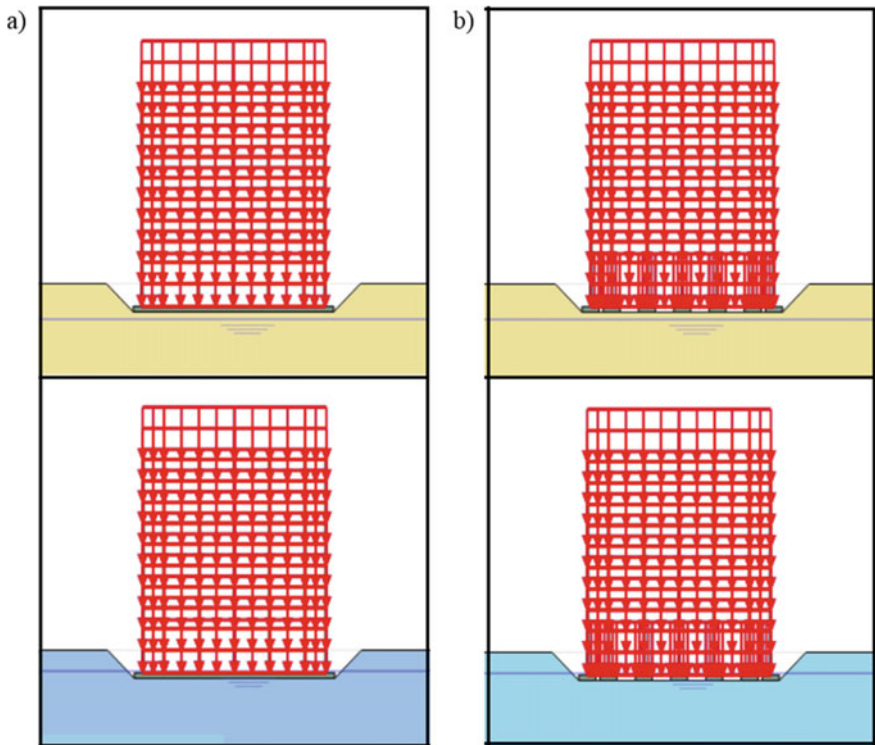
Calculation schemes of the building in Plaxis program: a for slab foundation; b for strip foundation
